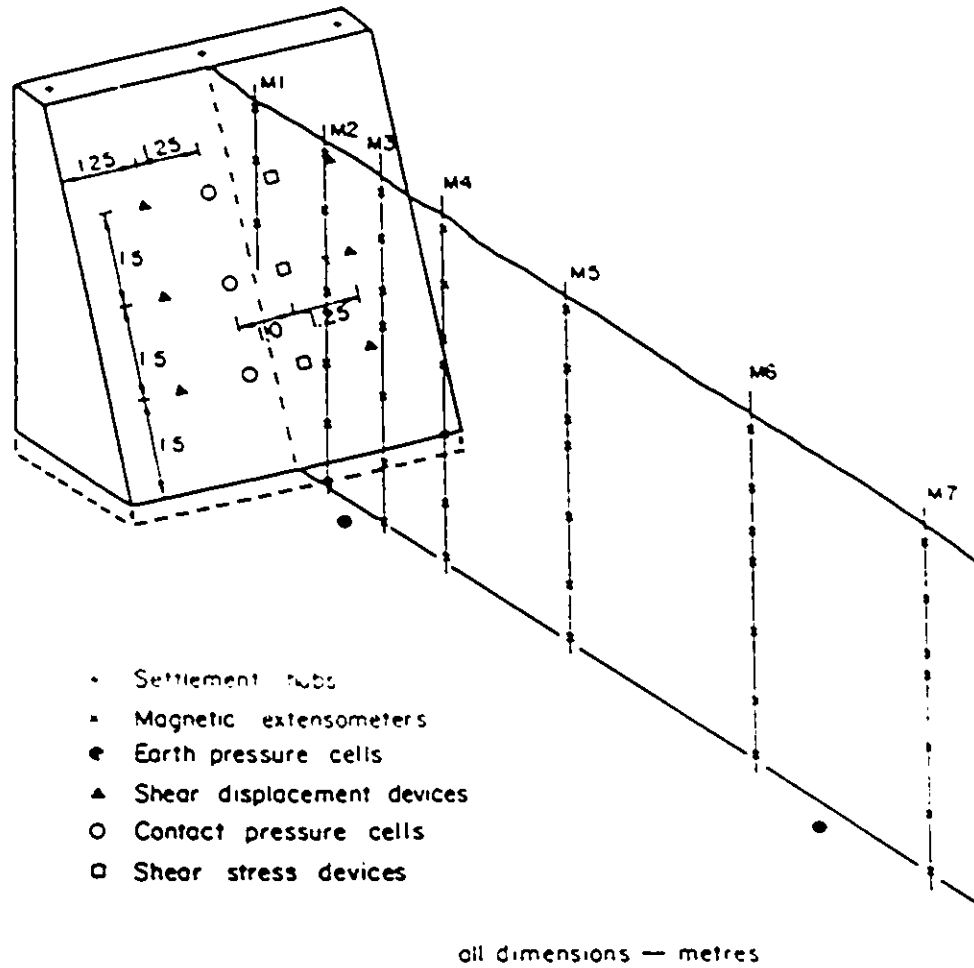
General View of Wall Instrumentation at Dickson Dam.
